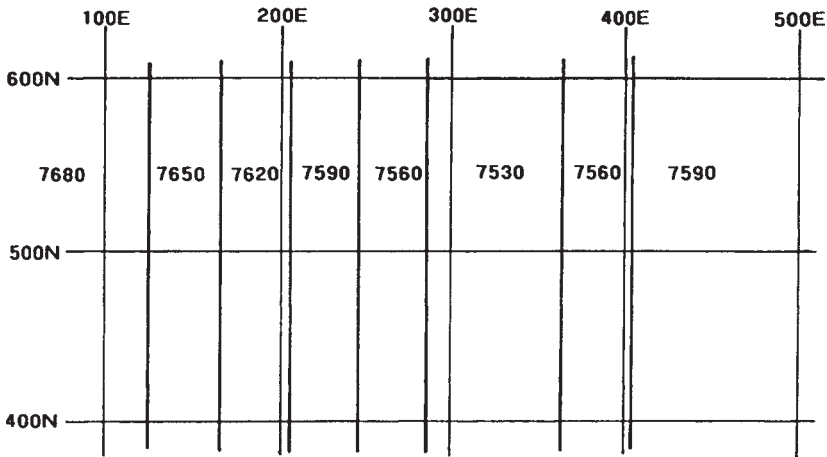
Resulting plan view corresponding to the midbench representation of Figure 4.84. The given elevations are bench toe elevations.
